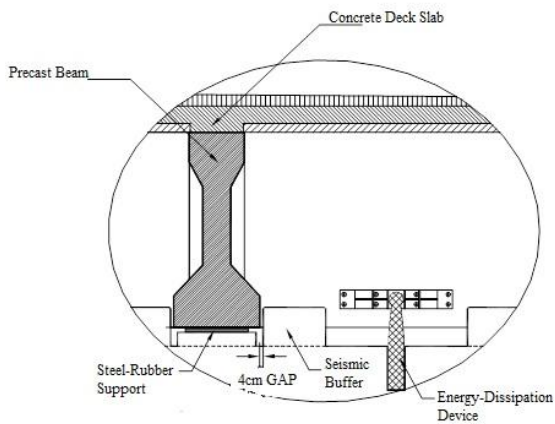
Detail of the support area of precast beam. See 4cm Gap
